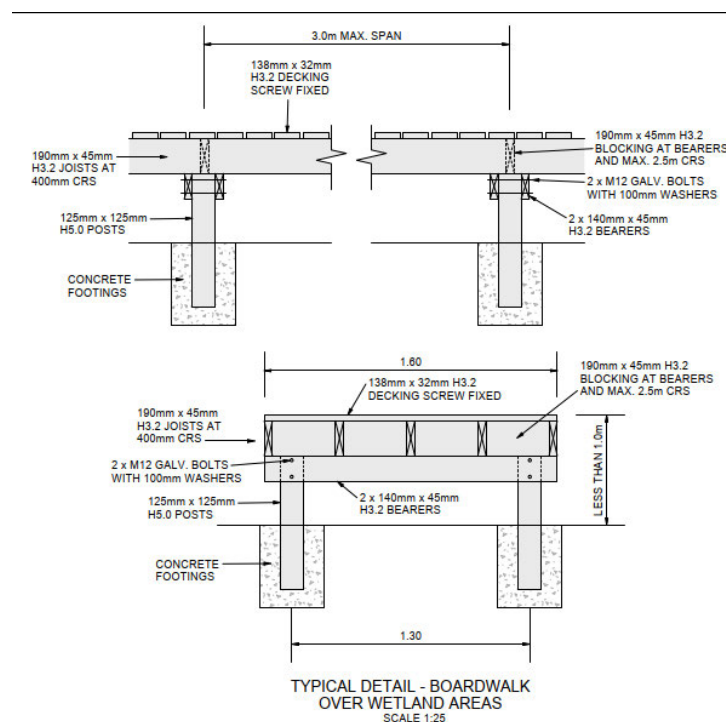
Typical detail of Boardwalk crossing over Wetland /Streams
